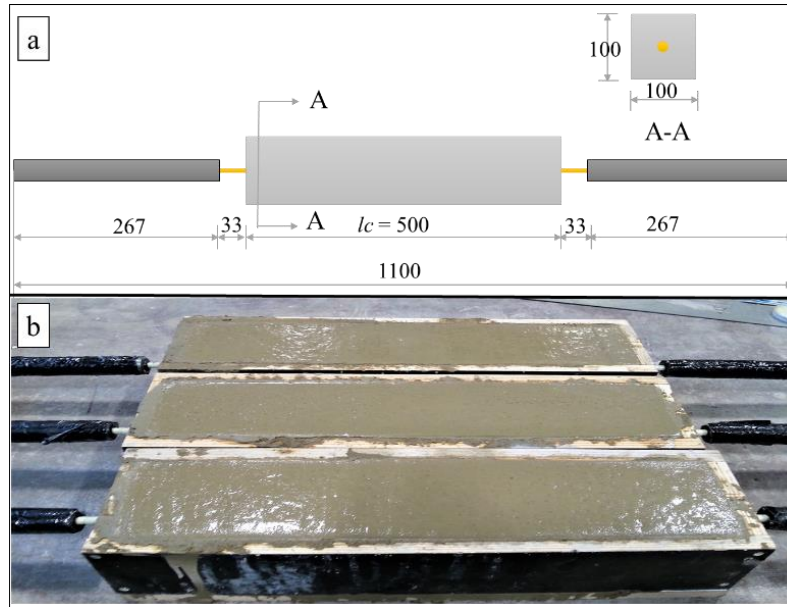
1 Geometric details of the Tension stiffening specimens (all dimensions in mm)
